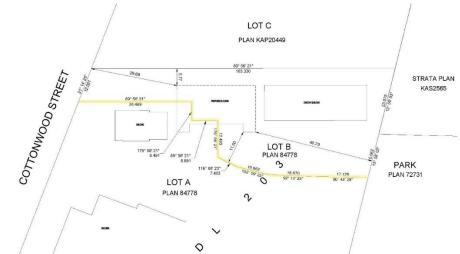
Highlighted existing interior lot line between 7396 Cottonwood St. and 7390 Cottonwood St.
